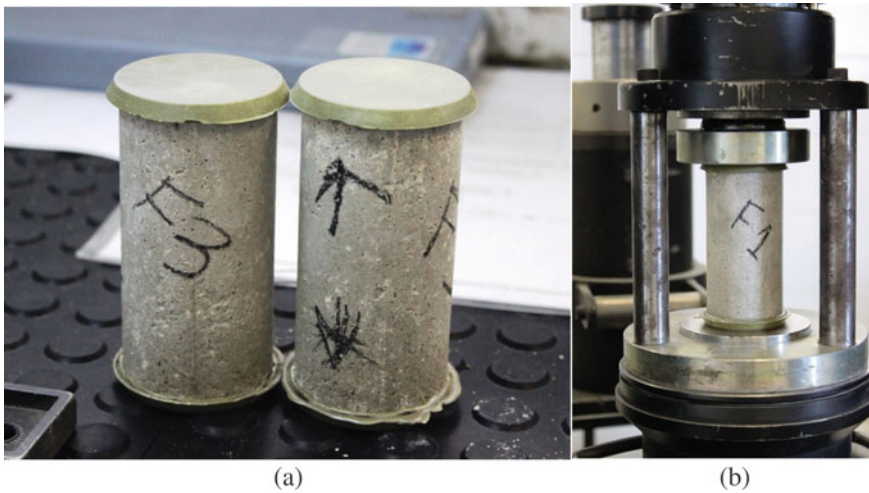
a Capped cylindrical specimens; b Equipment support device for compression test of cylindrical CP's 5 × 10 cm
